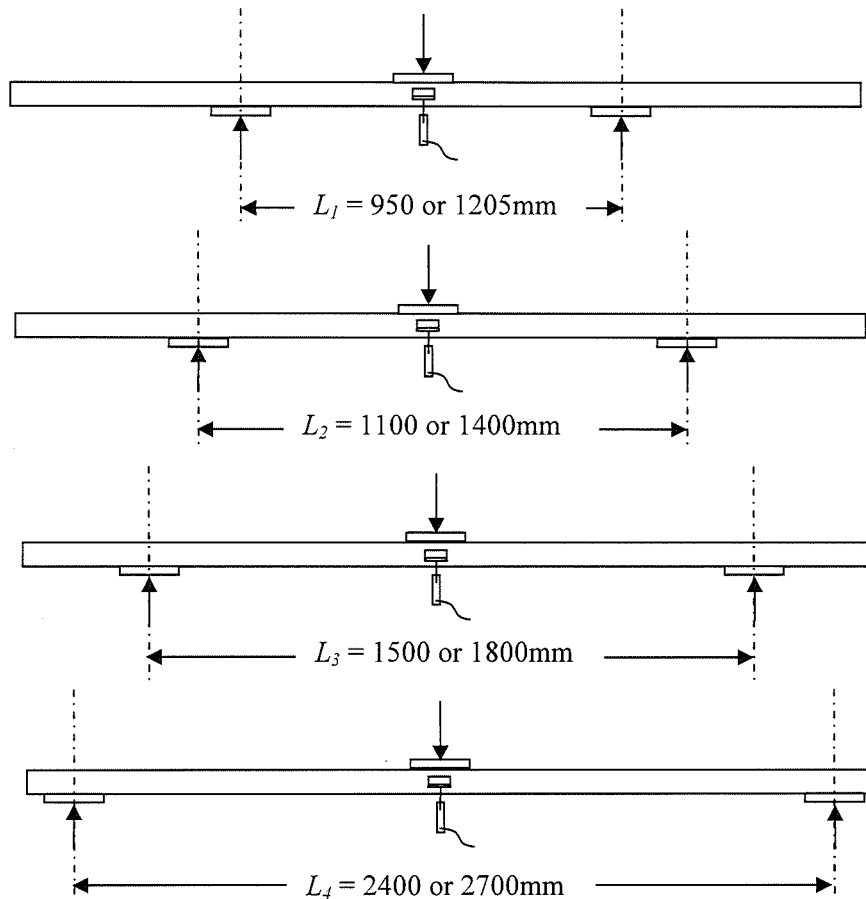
3 point bending test set-ups (smaller and larger dimensions are C24 and Timberstrand LSL fitch beams respectively).
